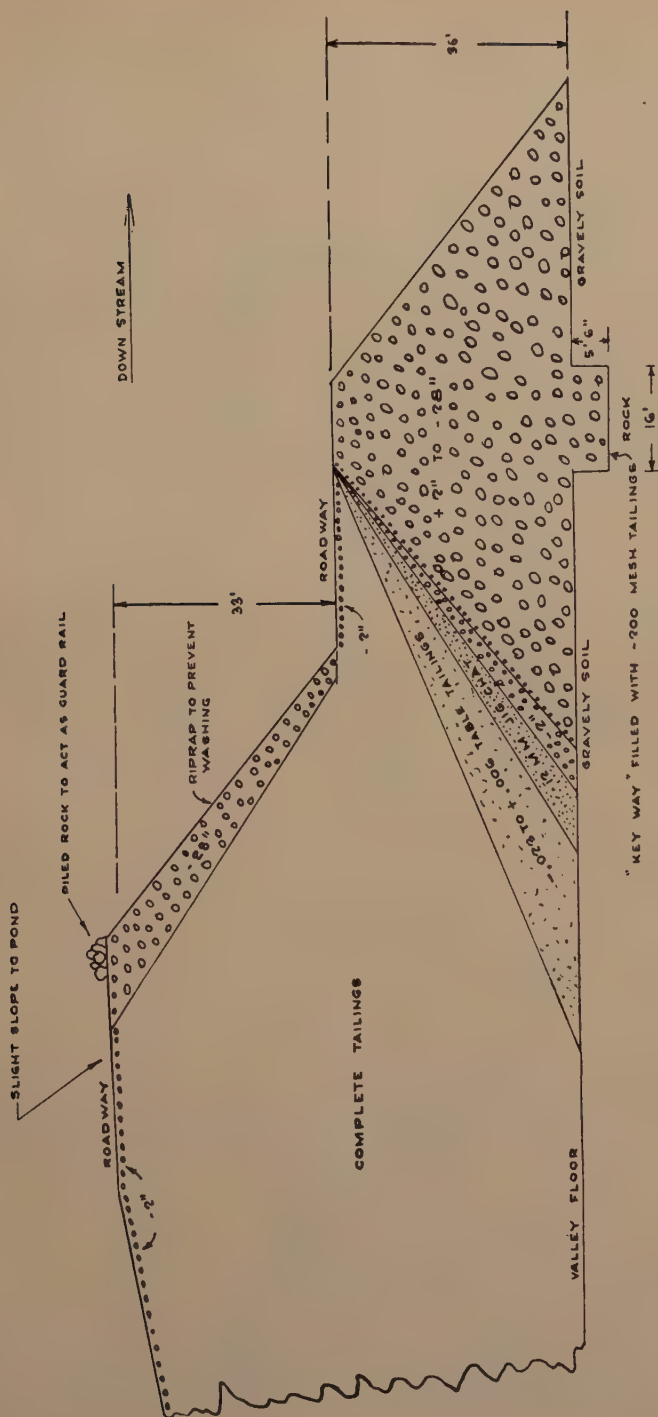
GENERALIZED CROSS SECTION, DAVIS CREEK DAM.
